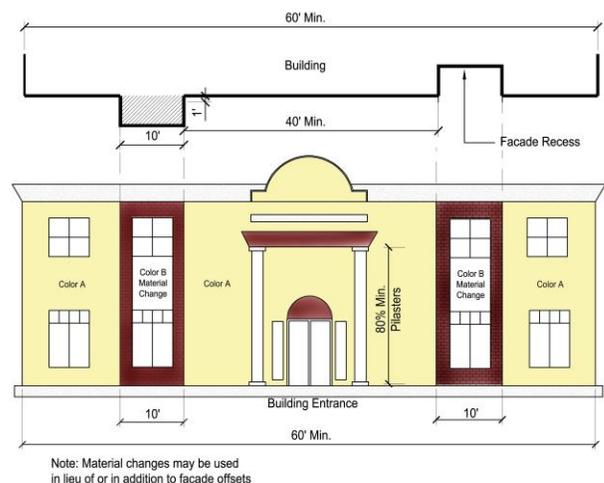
C.3.a: Front Façade Offsets. Buildings require offsets of other treatments to provide visual interest and break up long building walls.
